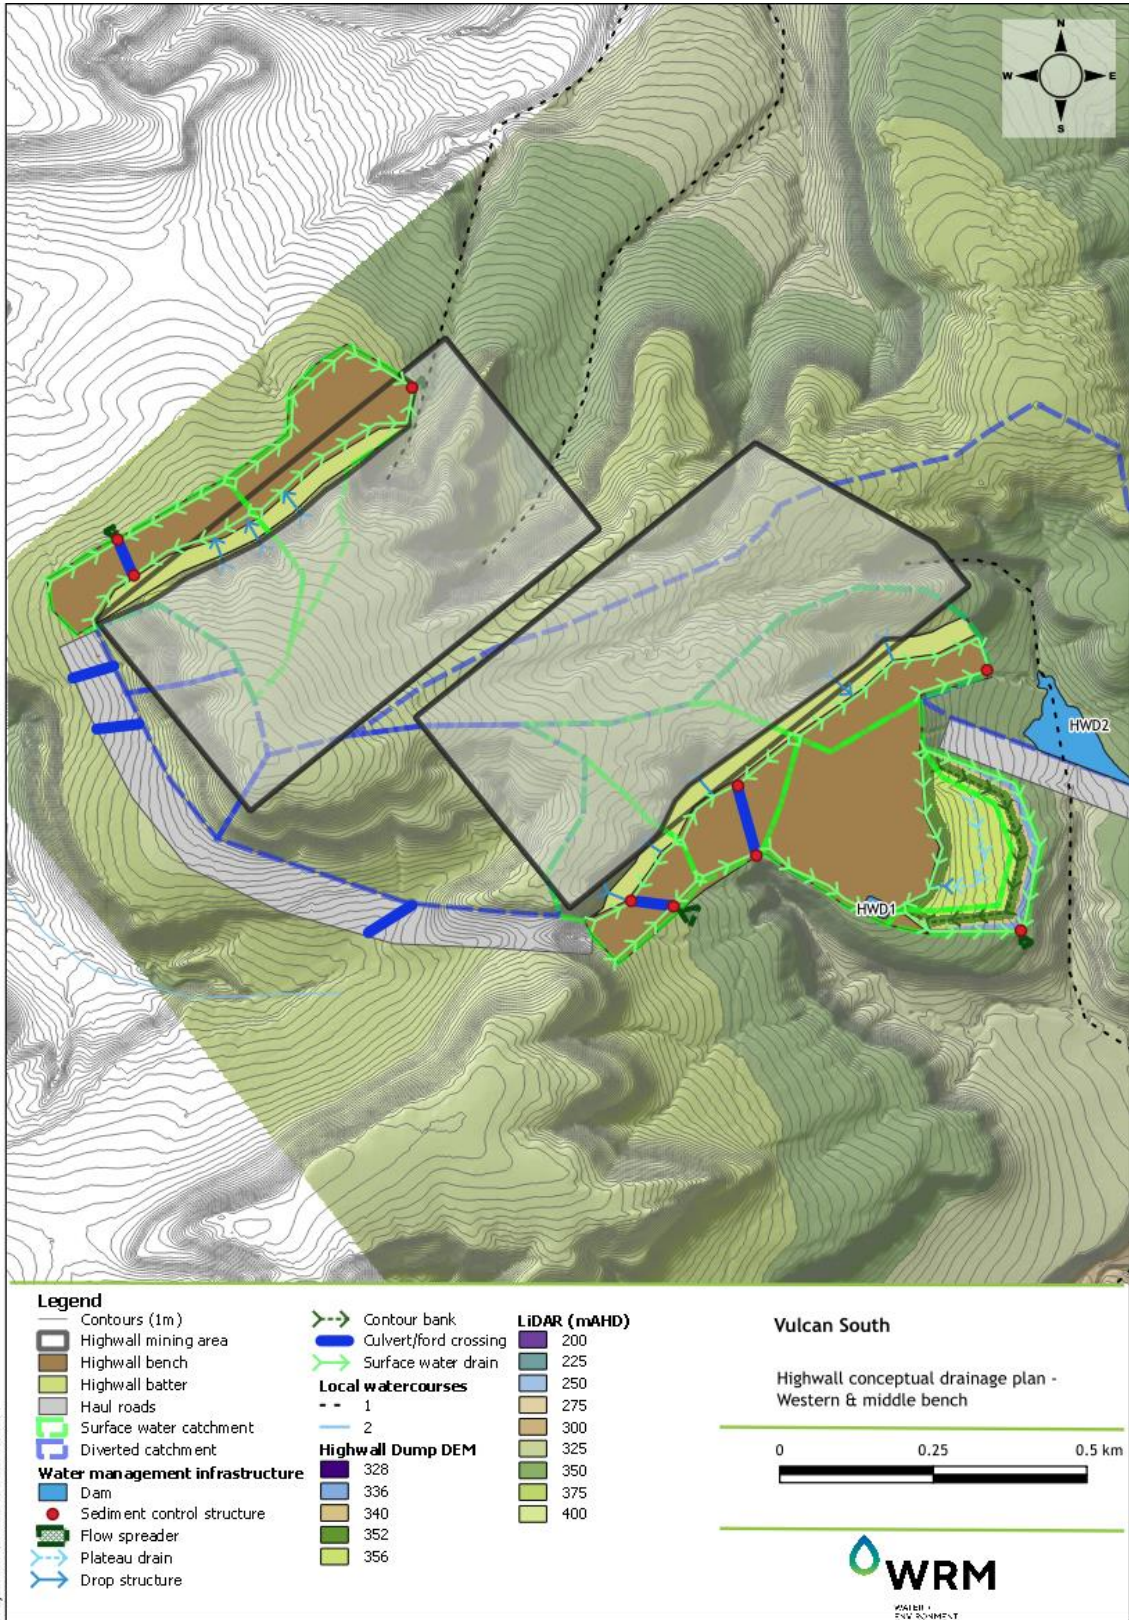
VS Highwall western and middle bench mining area conceptual drainage plan
